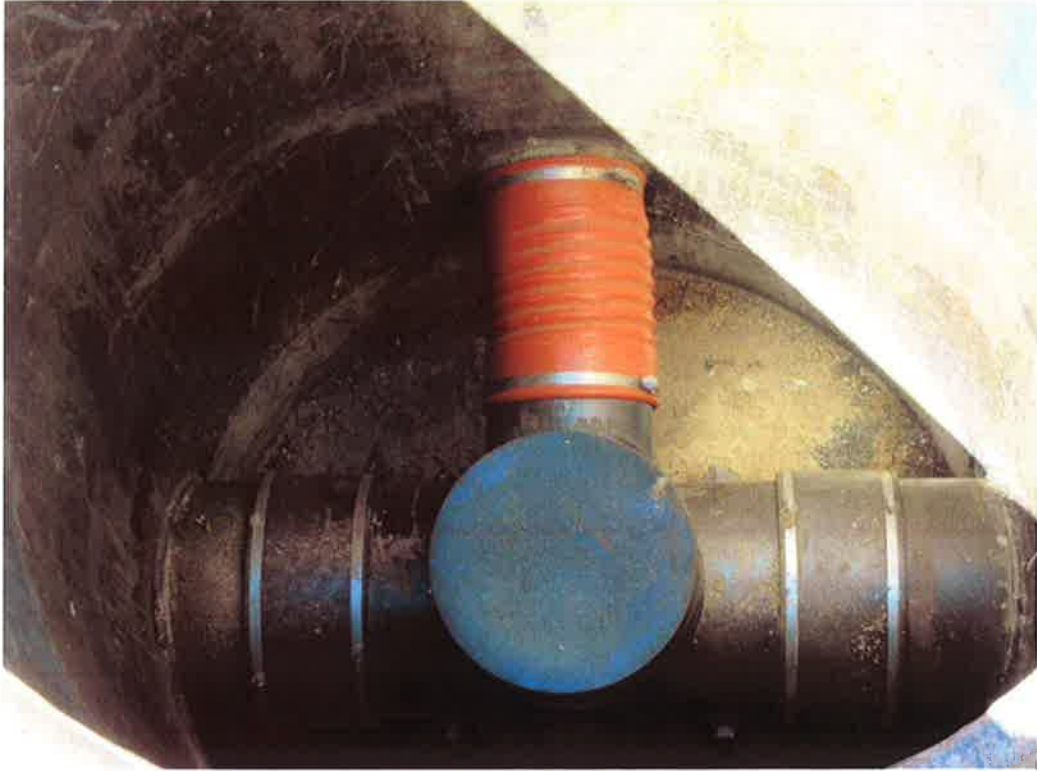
LCM 2 completion with typical 12 inch Fernco cap
